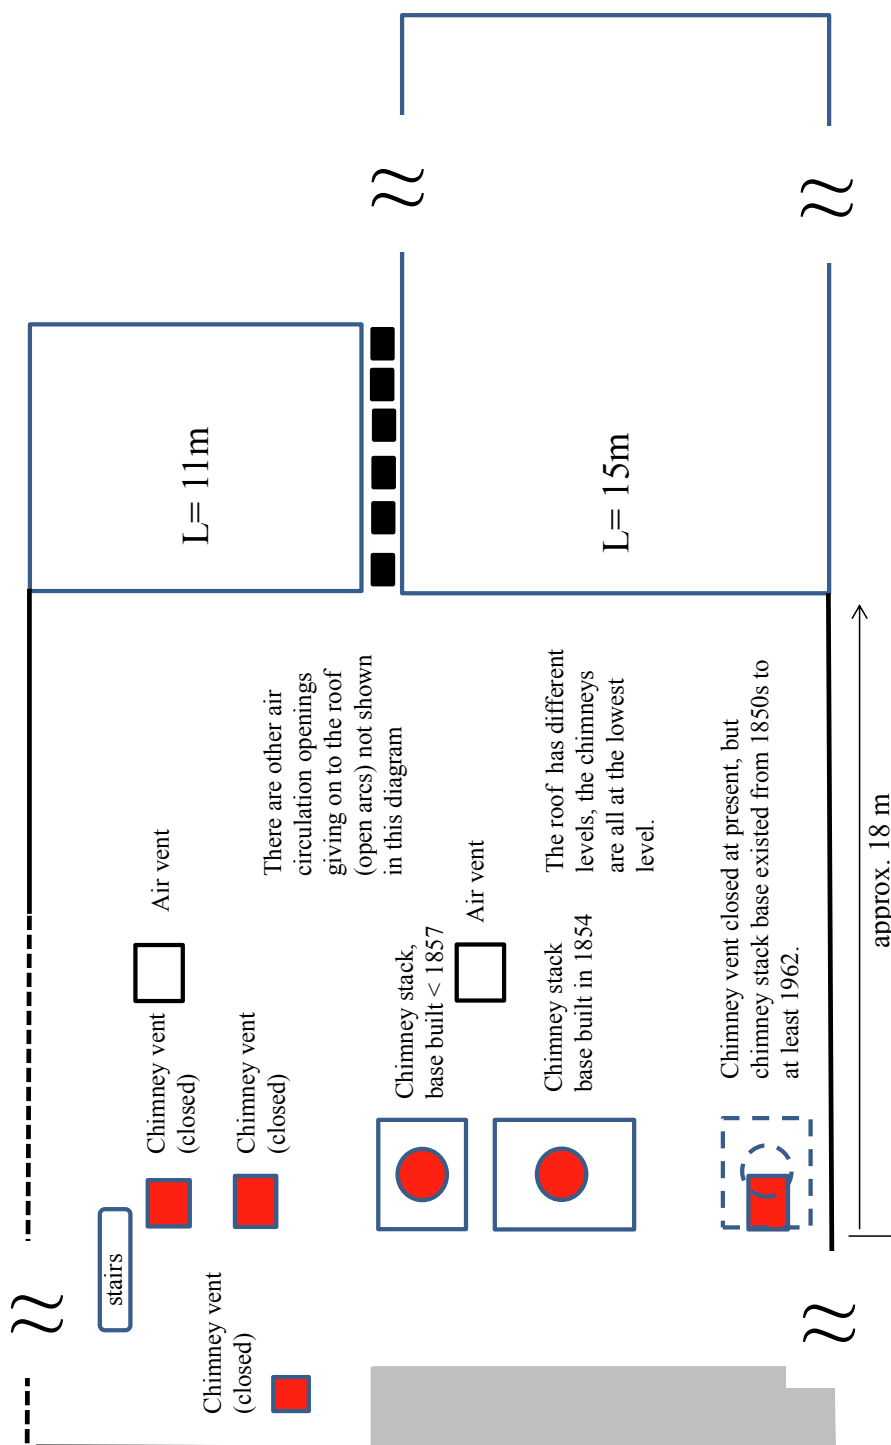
Plan of loading floor of Furnace Area B, at present without a roof.
